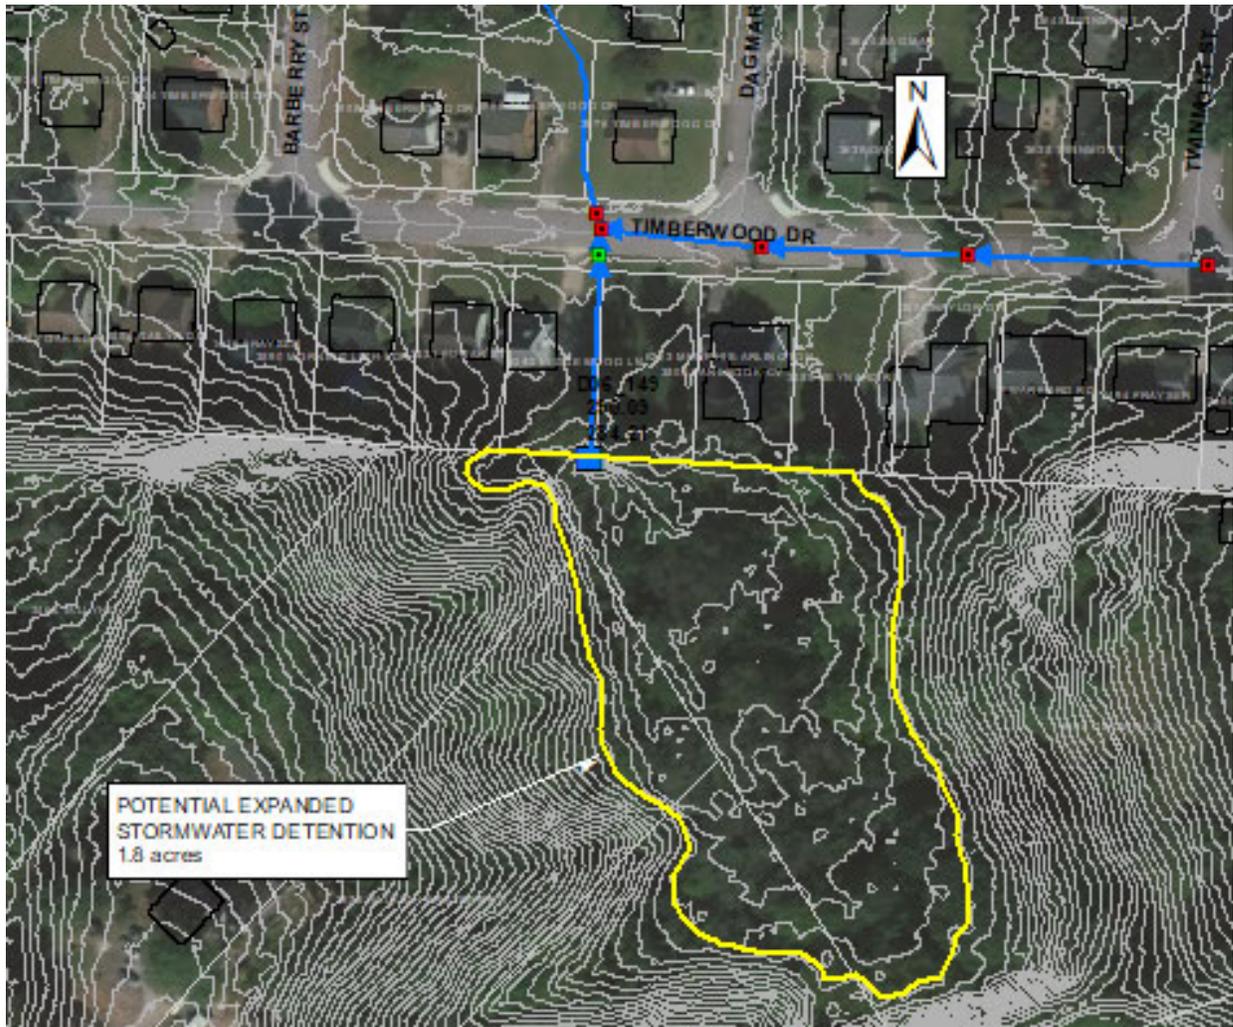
Potential Expanded Detention Upstream of Timberwood Drive
